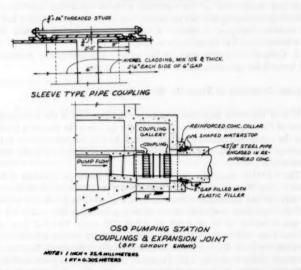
Schematic Cross Section of 8-ft Pipe Connection and Detail of Sleeve-Type Pipe Coupling
